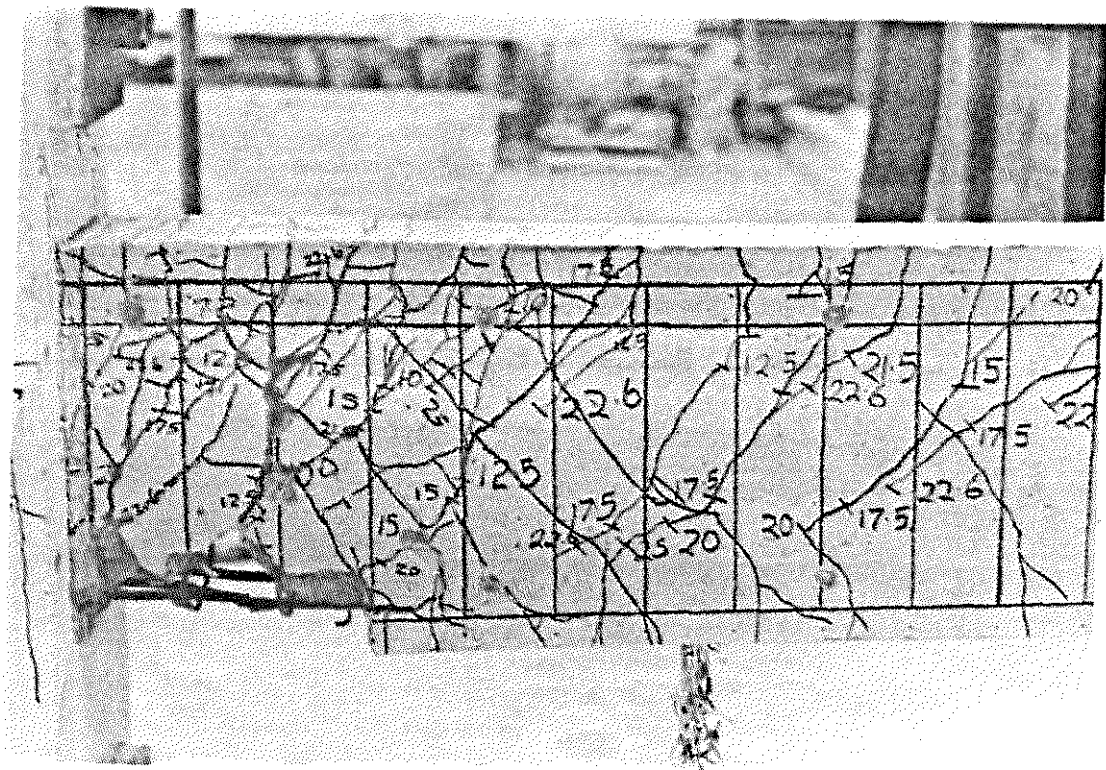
(c) Beam F-2 at Conclusion of Test
